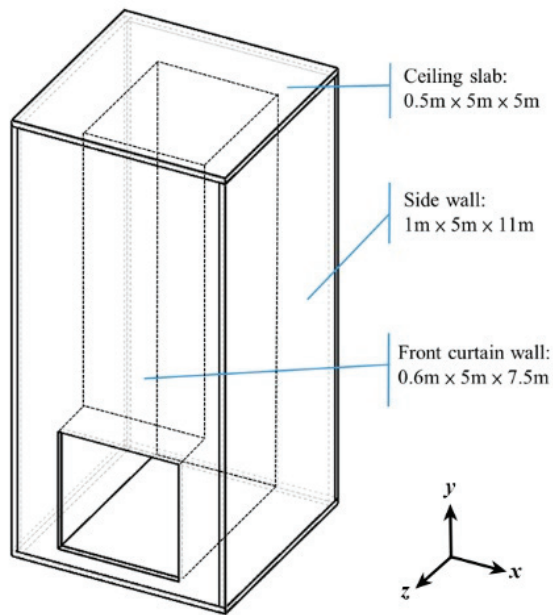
Dimensions of the structural members of OWC chamber in the caisson breakwater.
